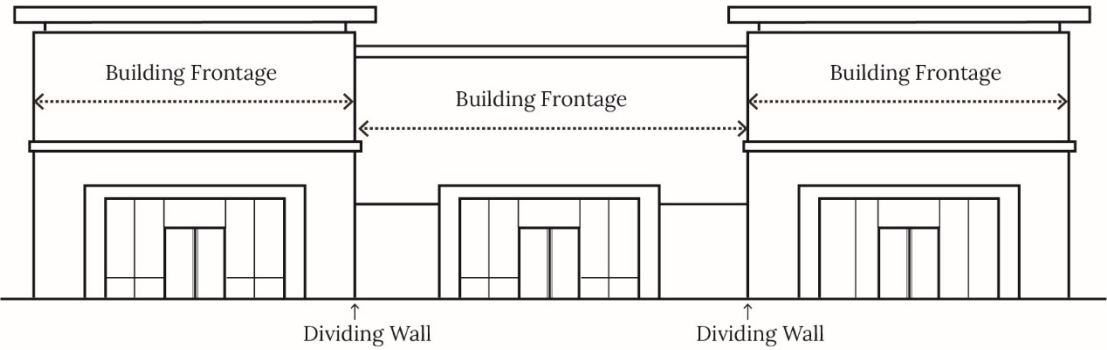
Illustration of Building Frontage on a Multi-Tenant Building
